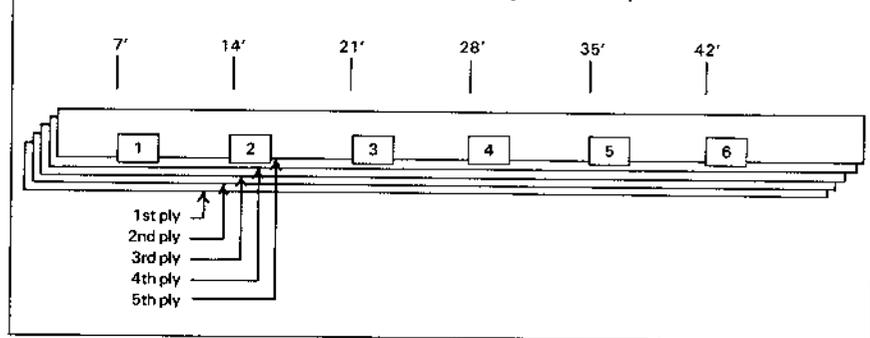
Test Coupon Placement—Mechanical Spreader Samples
